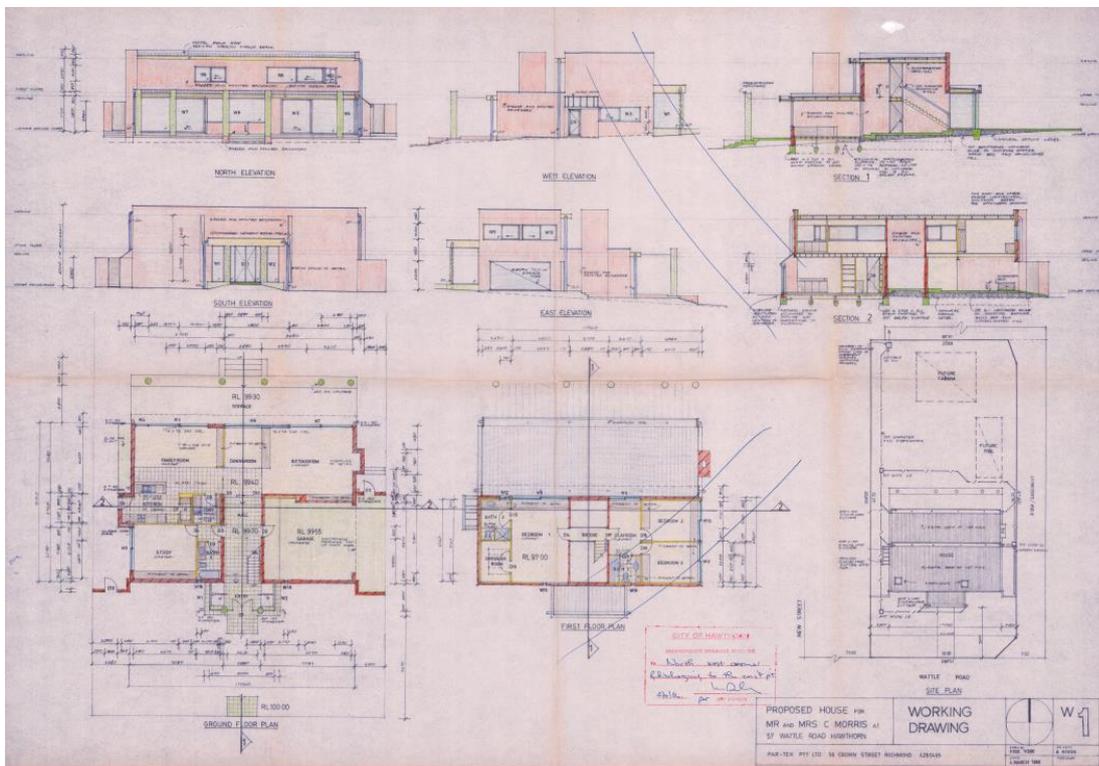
Working drawing sheet for 57 Wattle Road, Hawthorn by Clerehan Cran Architects Pty Ltd. (Source: City of Boroondara)
